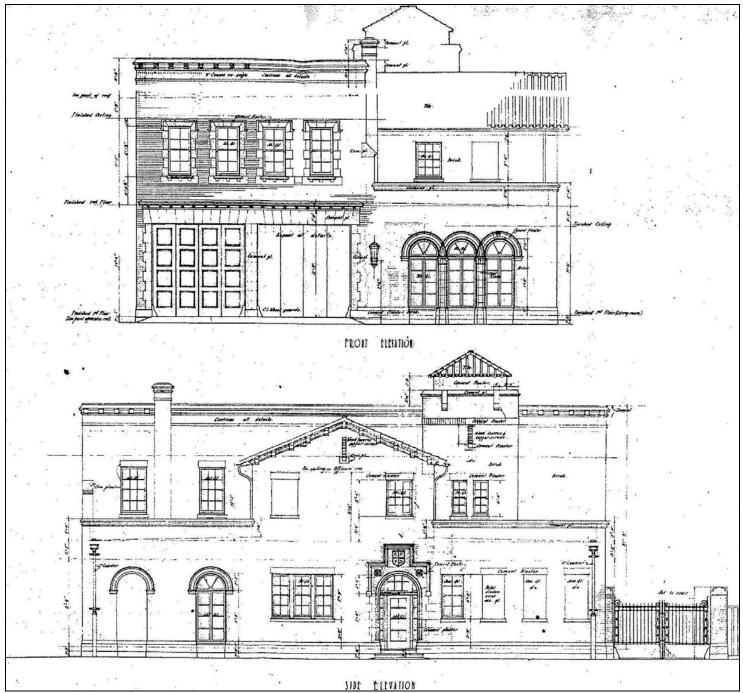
Original Plans for Fire Station #30 (Engine Company 18), front elevation, 1925.
